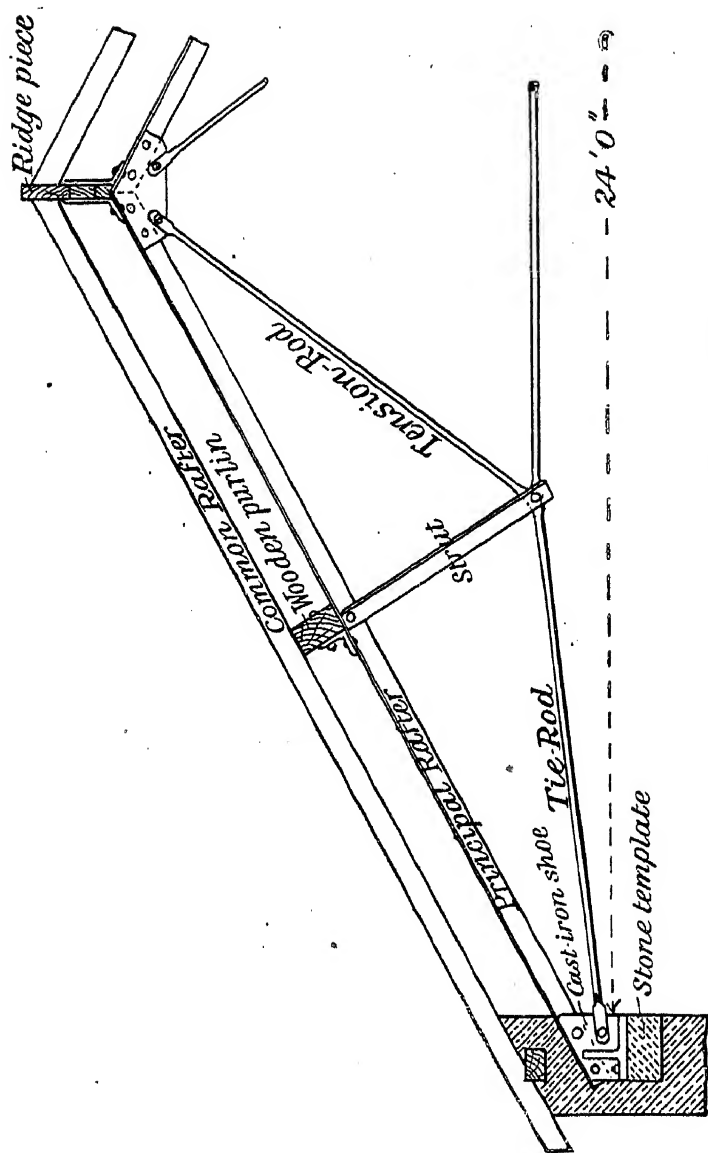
Part Elevation of an Iron Roof Truss for a 24' Span.
